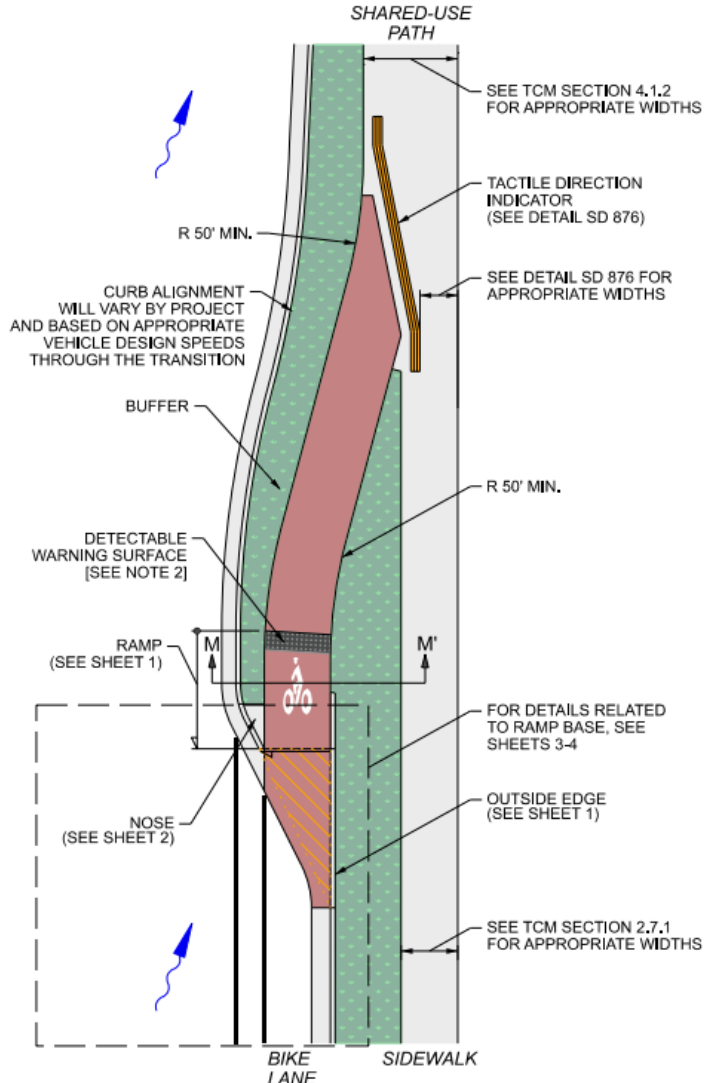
Lateral shift bicycle ramp alignment with minimal width sidewalk buffer
